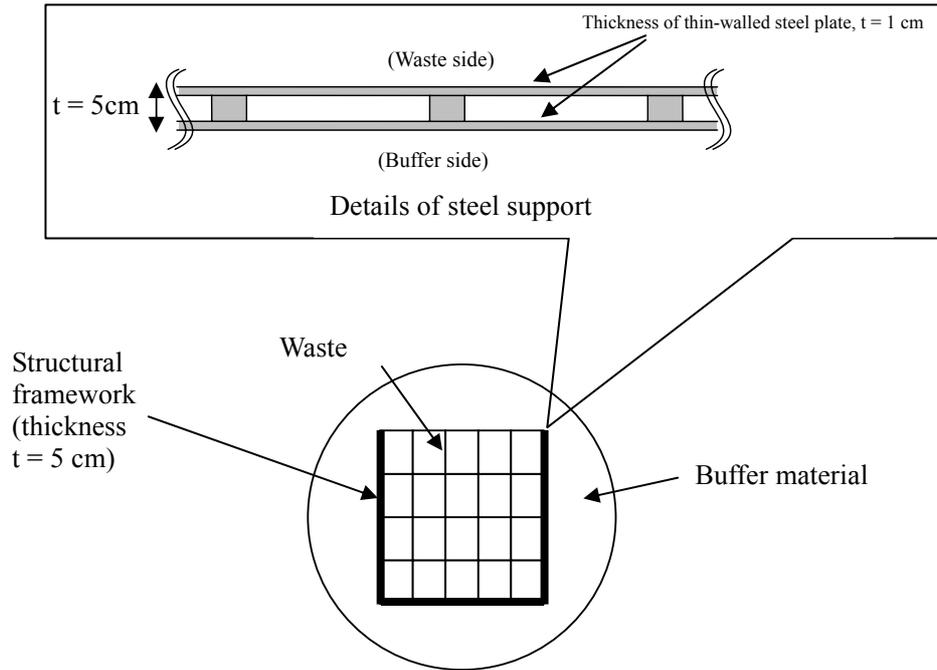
Shape of steel structural framework (example)
